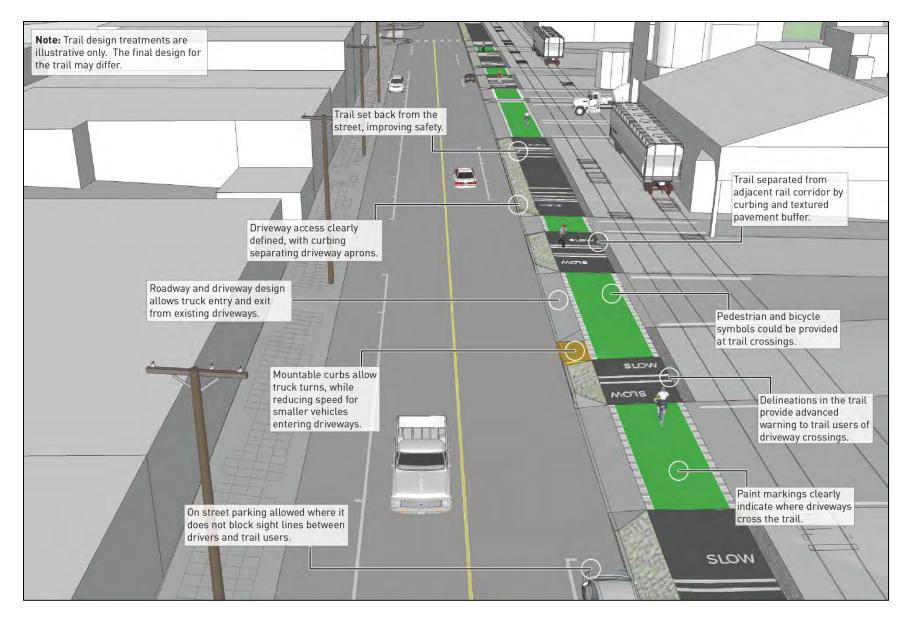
Potential Roadway Design and Safety Modifications (Shilshole Ave NW, at Salmon Bay Sand and Gravel)
